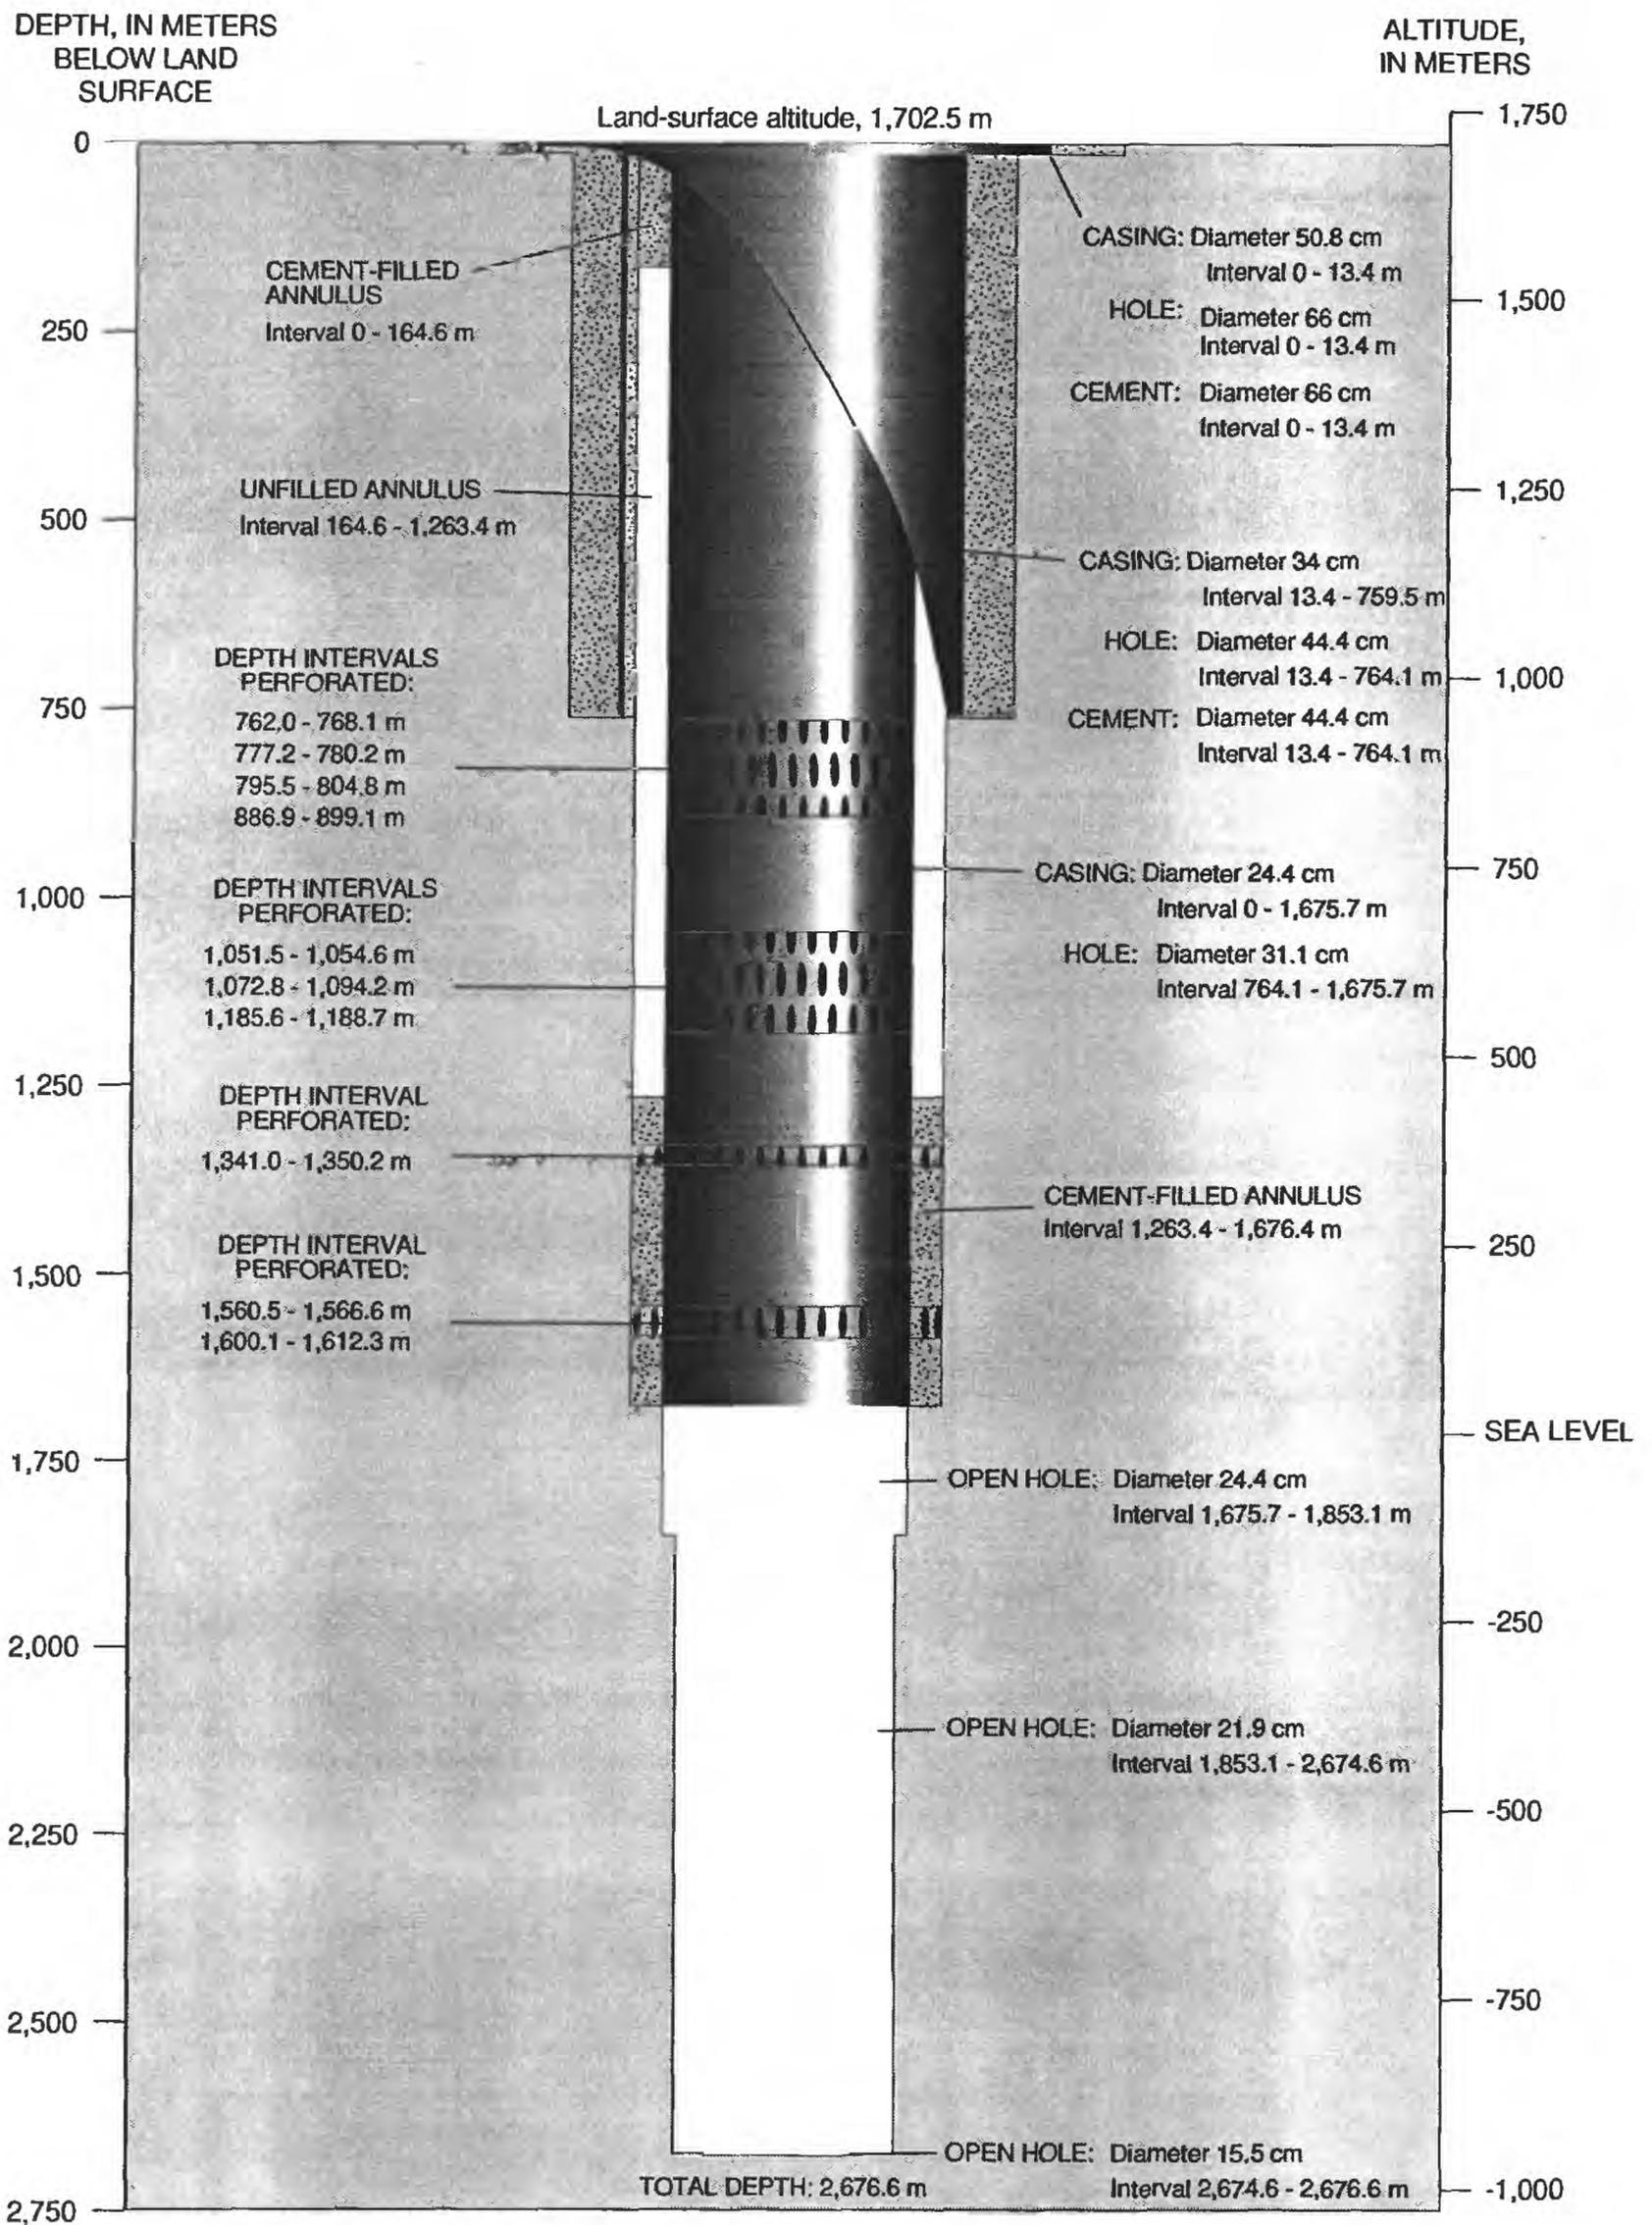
Construction details at well PM-2 from drillers' log. (Abbreviations: cm, centimeter; m, meter.)
